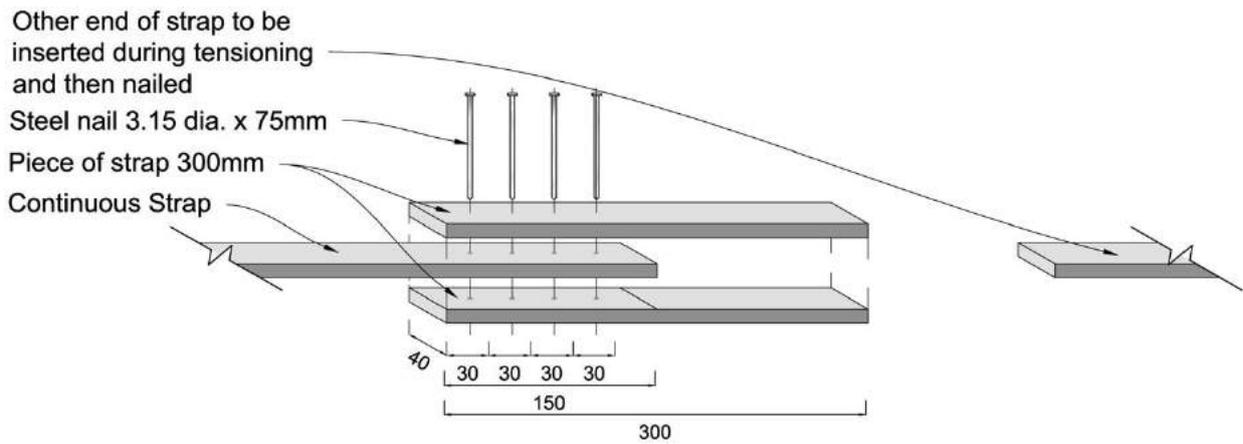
Joint nailing at one end of a strap to be completed before tensioning the strap. For a high or long wall it may be necessary to join two straps using this detail before tensioning.
